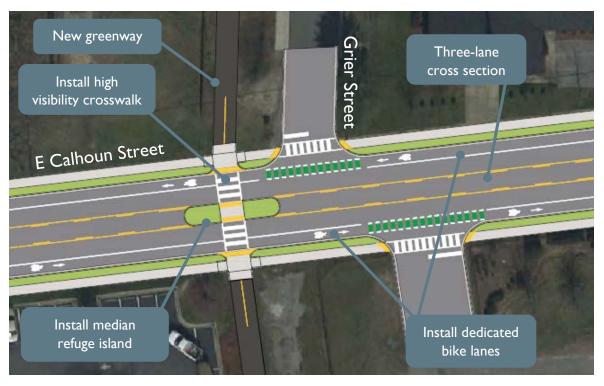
| E. Calhoun Street/Grier Street Intersection Conceptual Improvement
